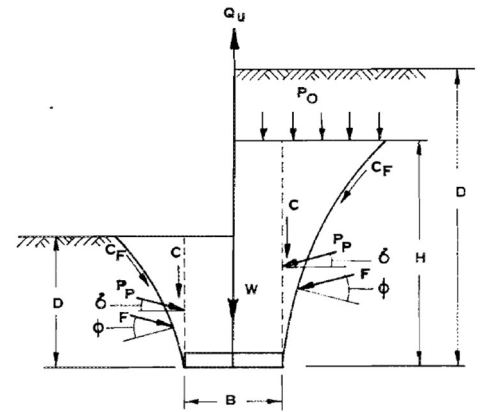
Failure surface of a plate anchor under uplift load (Meyerhof & Adams, 1968)
